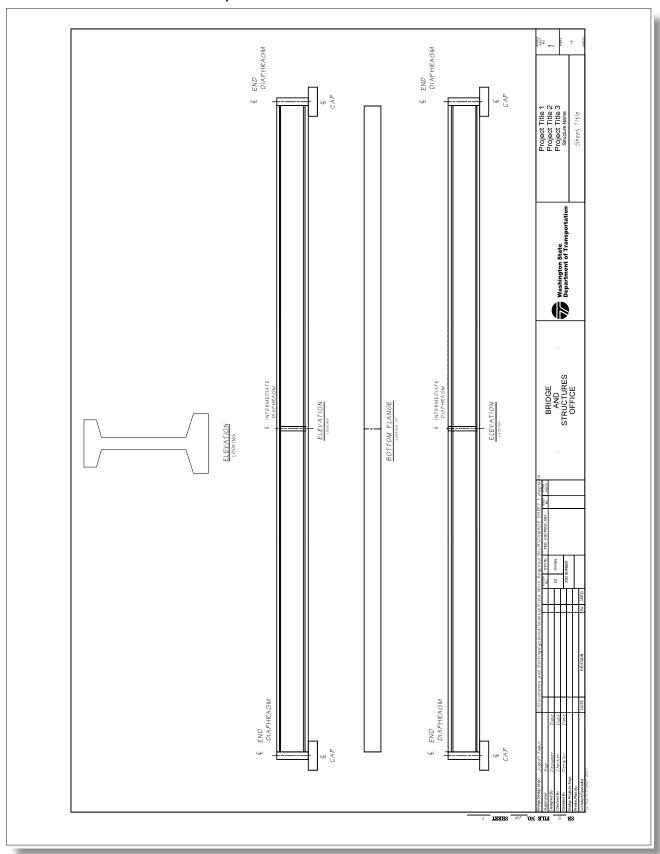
Visual NSTM Inspection Report (Page 2 of 2)
